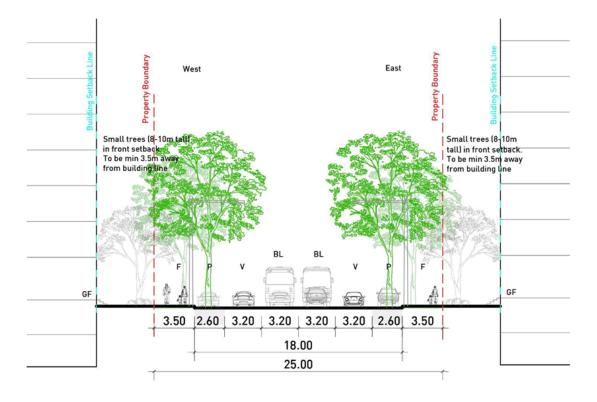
Type 1a Major Road Building to Building (NSR 2)
